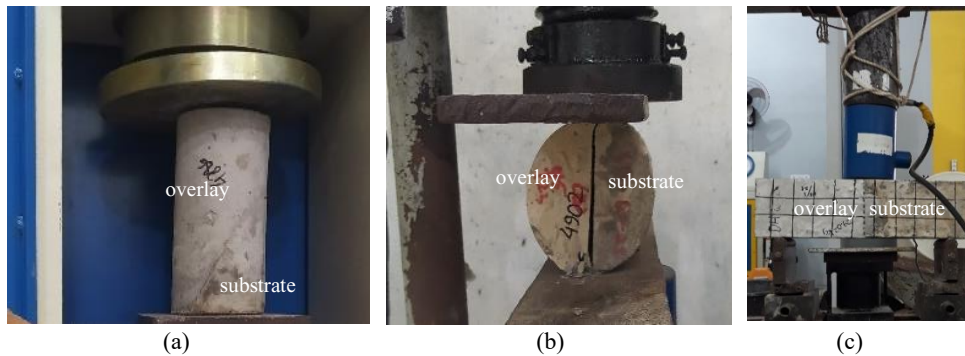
Specimens and test setups: (a) slant shear (b) splitting tensile (c) flexure
